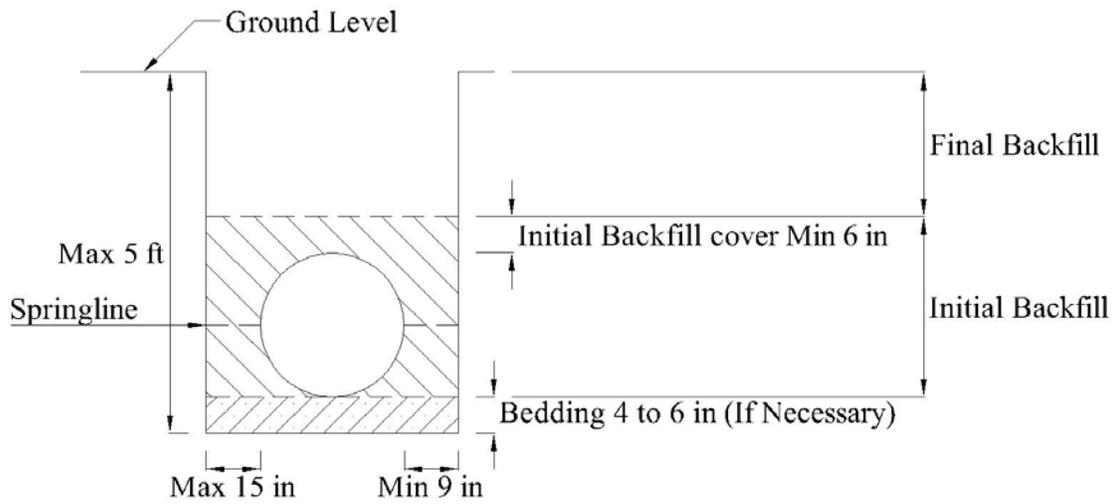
Typical Trench with flat bottom, Manual Installation of Backfill
